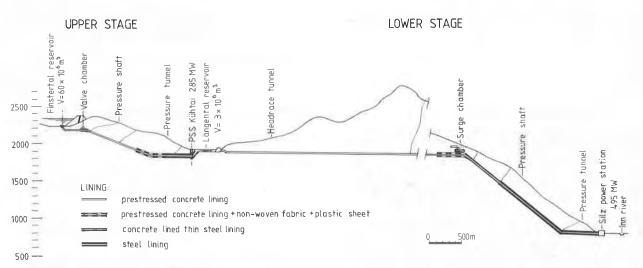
Cross section showing the lining of the Kühtai upper stage and the Silz pressure shaft
